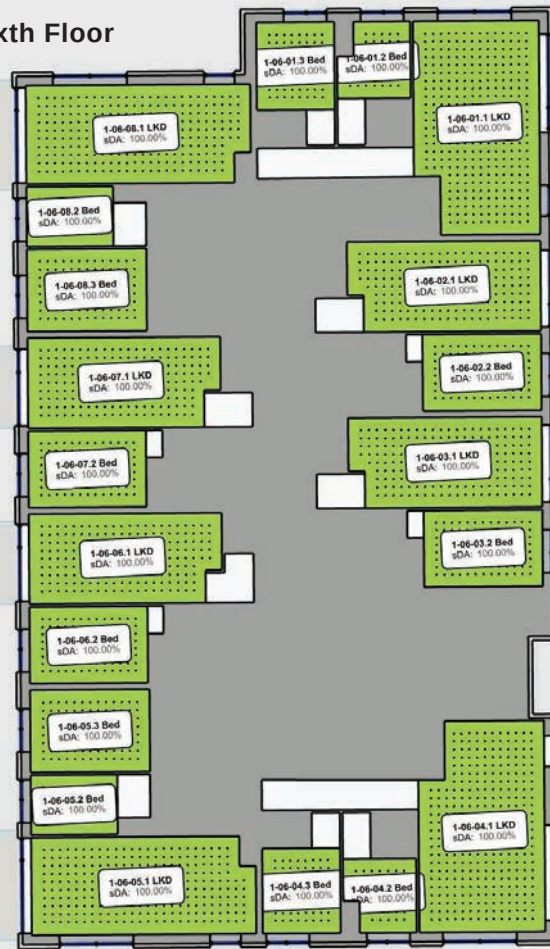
Block 1 - Floor plans indicating Daylight Provision to BS EN 17037:2018+A1:2021
